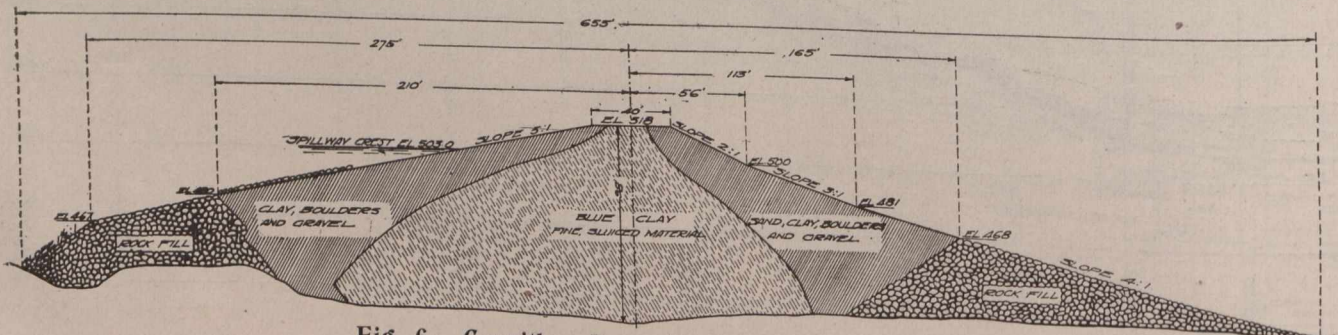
Coquitlam Dam, Maximum Cross-Section as Built.
